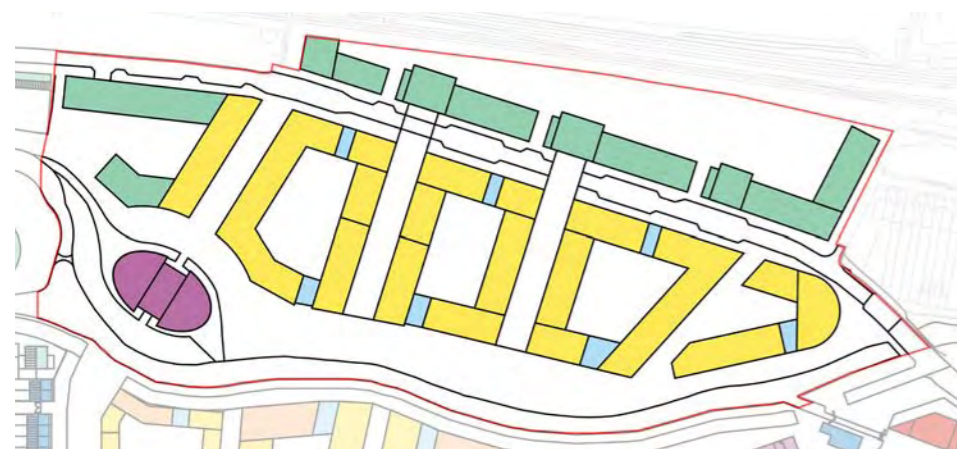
# DETAIL PLAN & CORE DESIGN PRINCIPLES
